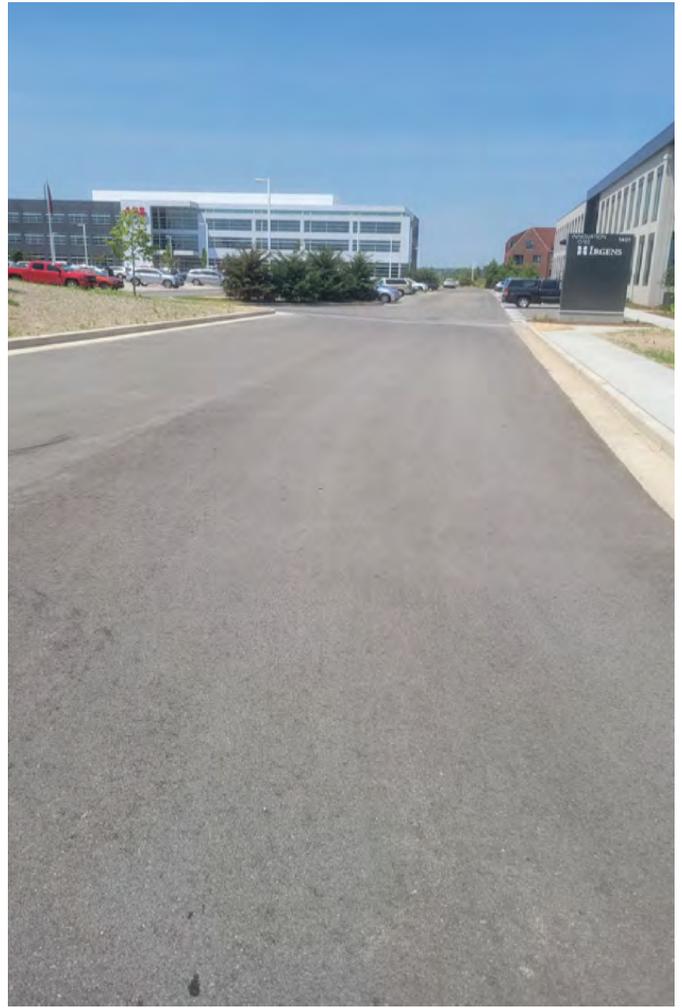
Asphalt paved entrance to Lot 3 and driveway along Building A. Concrete curb and gutter and sidewalk along the south side of Lot 3. View to west; photograph taken on June 1, 2023.
